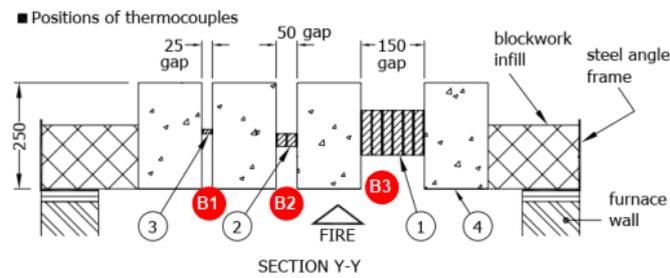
Cross-section of floor linear gap systems B1-B3 – assessment 1 (as shown in WF 148052) – dimensions in mm
